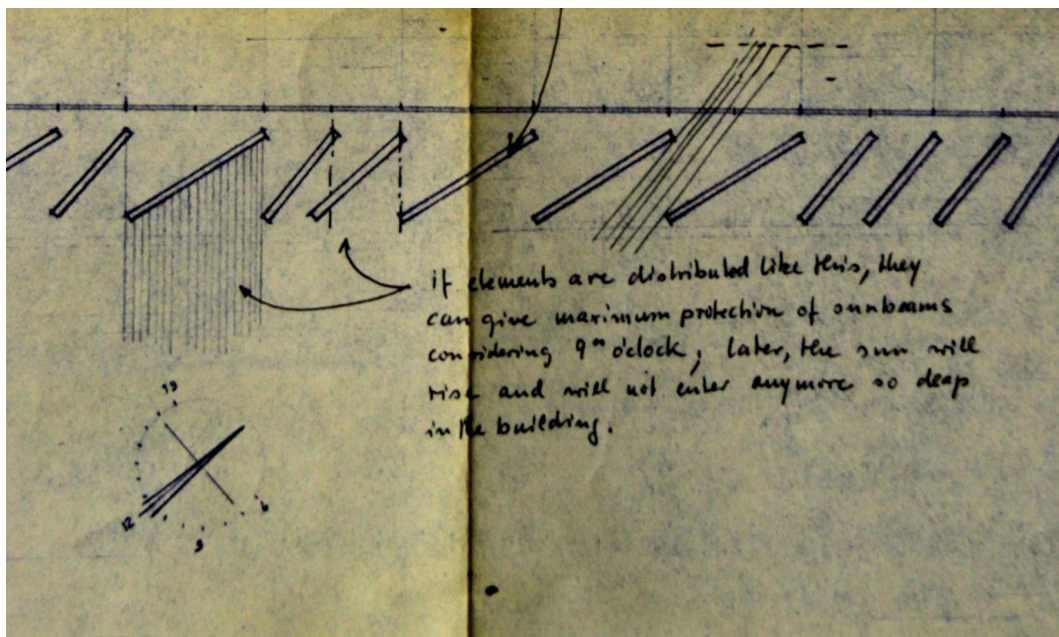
Hans Müller, a remark explaining the technical function of the new sun breakers design, a detail of the 1.10.1968 plan (Shlomo Gilead Collection, Israel Architecture Archive)
